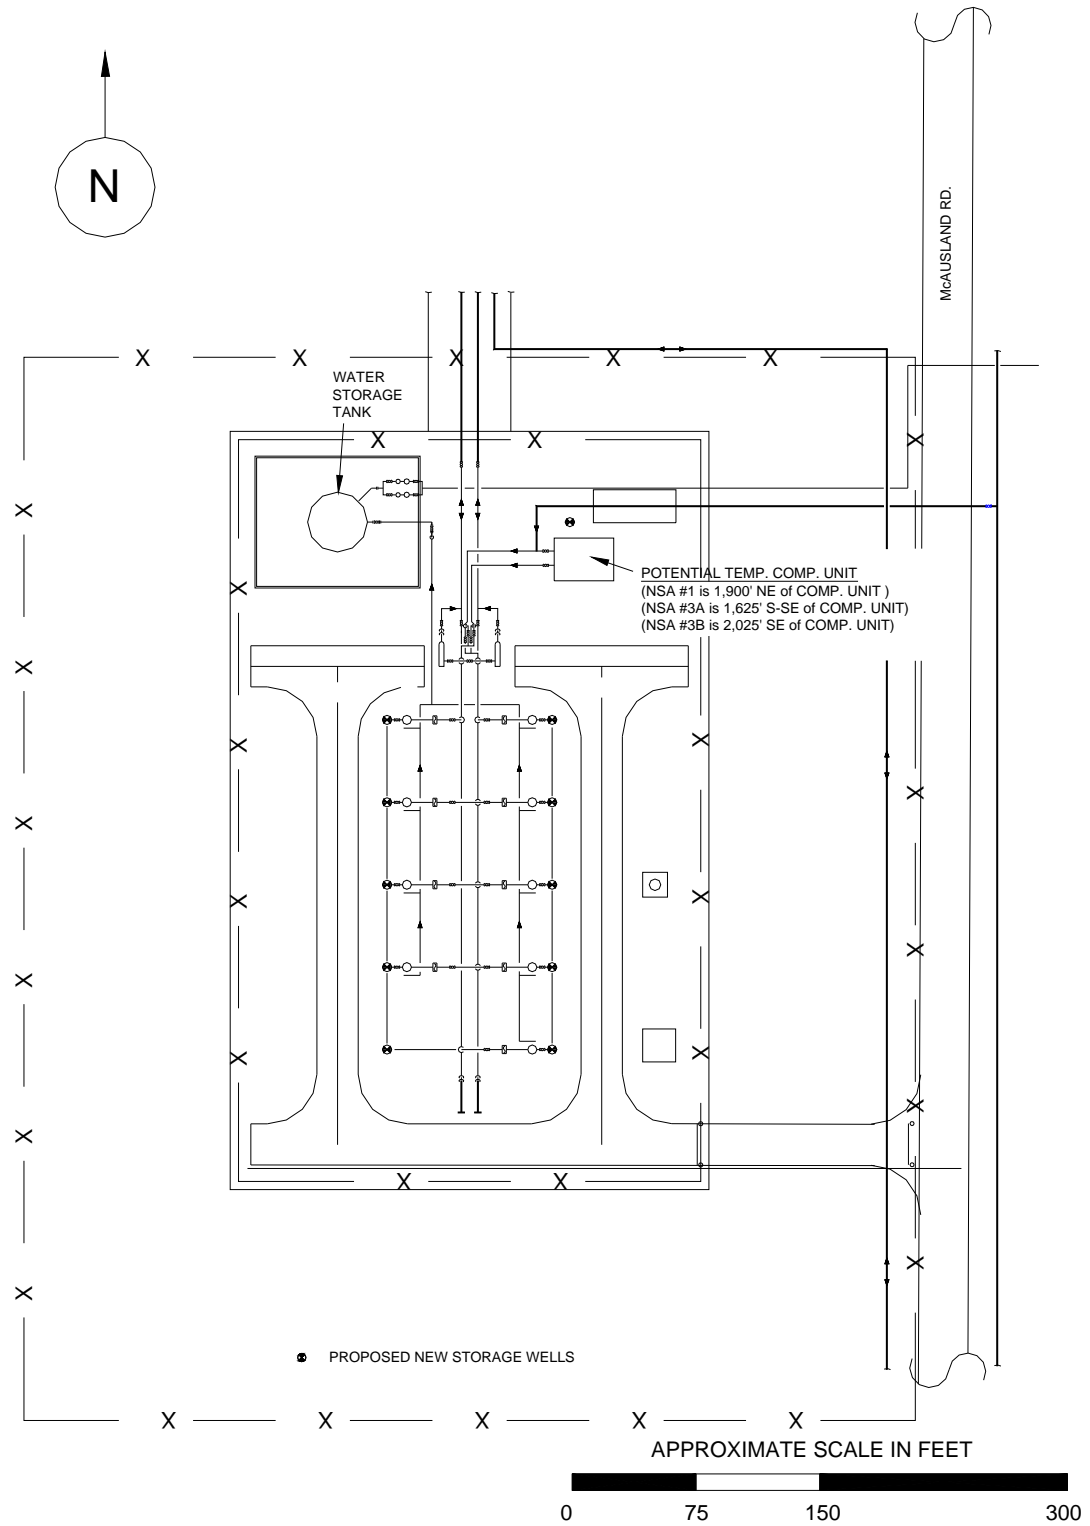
Proposed Central Valley Gas Storage Well Pad Site Plot Plan
